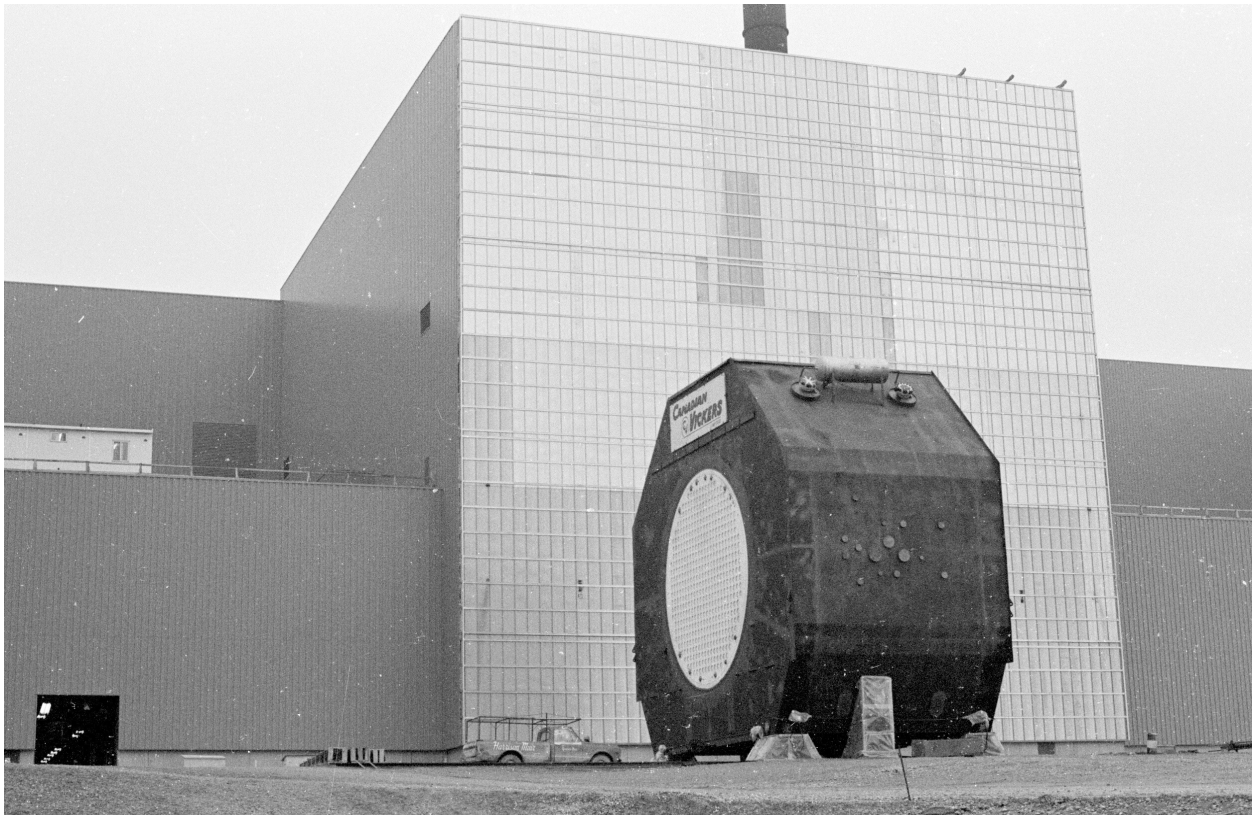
Calandria and shield tank assembly at Bruce, before being moved into the reactor vault.
